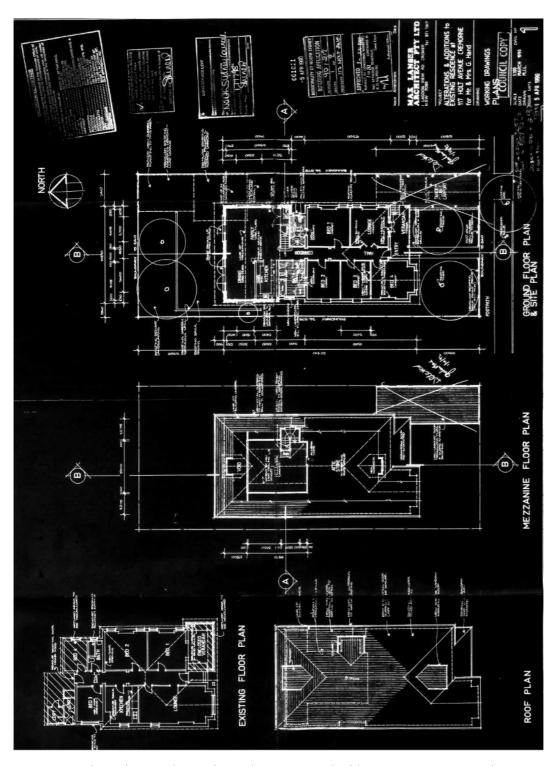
Floor plans and site plan—alterations and additions to existing residence at 117 Holt Avenue, Cremorne, for Mr and Mrs G Hand, March 1990 / Max Lanser Architect Pty Ltd. (Source: North Sydney Council, Building Application 90/11, Sheet 1 of 2)
